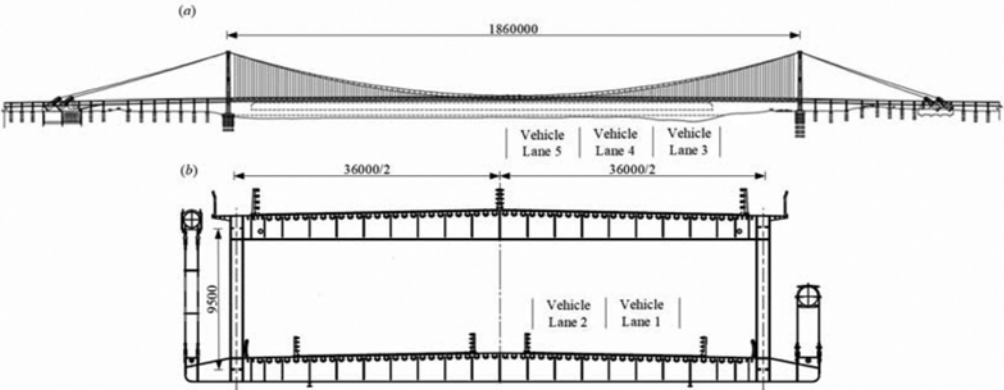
The layout of the bridge (Unit: mm): (a) bridge elevation; (b) cross section of stiffing girder.
